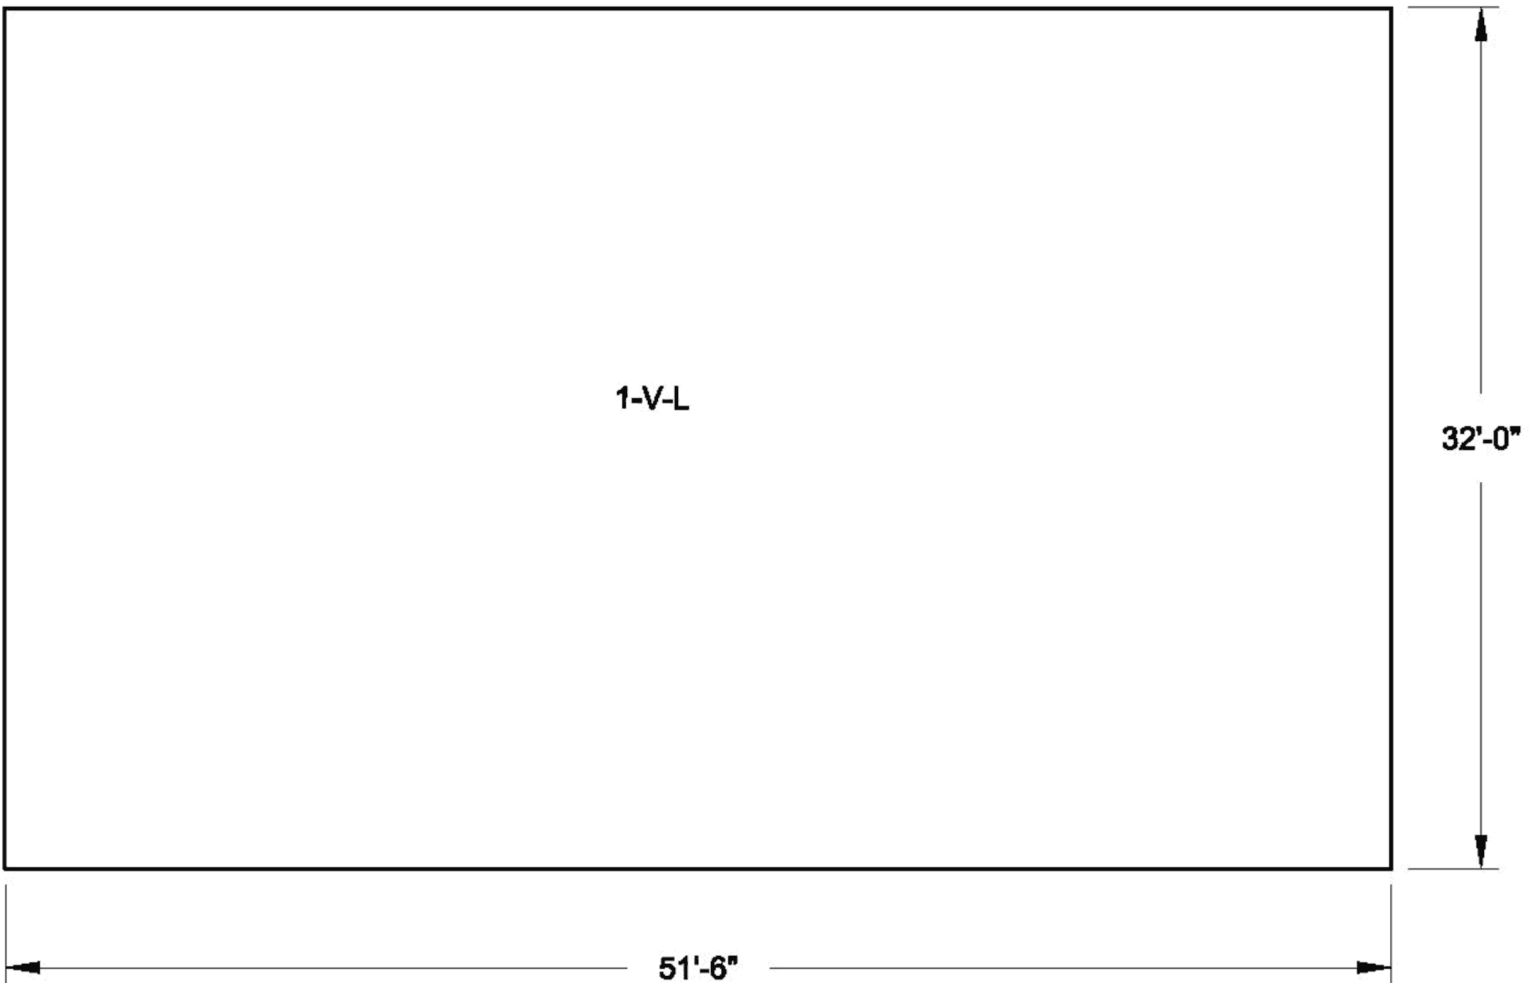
H.6-150 DGFOV Roof 2 Looking Down
